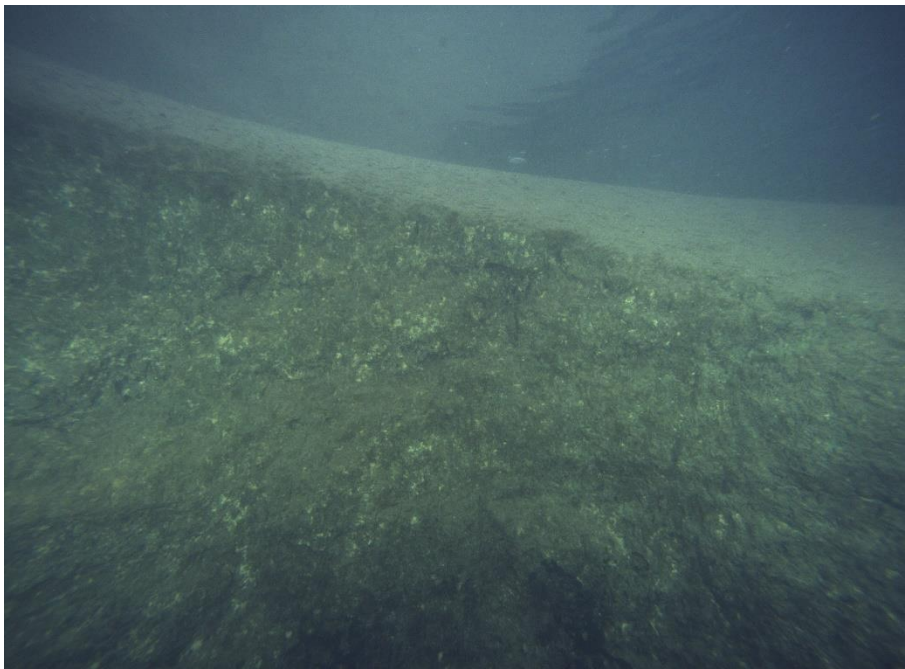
Western end of inlet concrete headwall. The headwall appears intact with no signs of major spalling or concrete damage. The concrete is covered in thick fouling.
